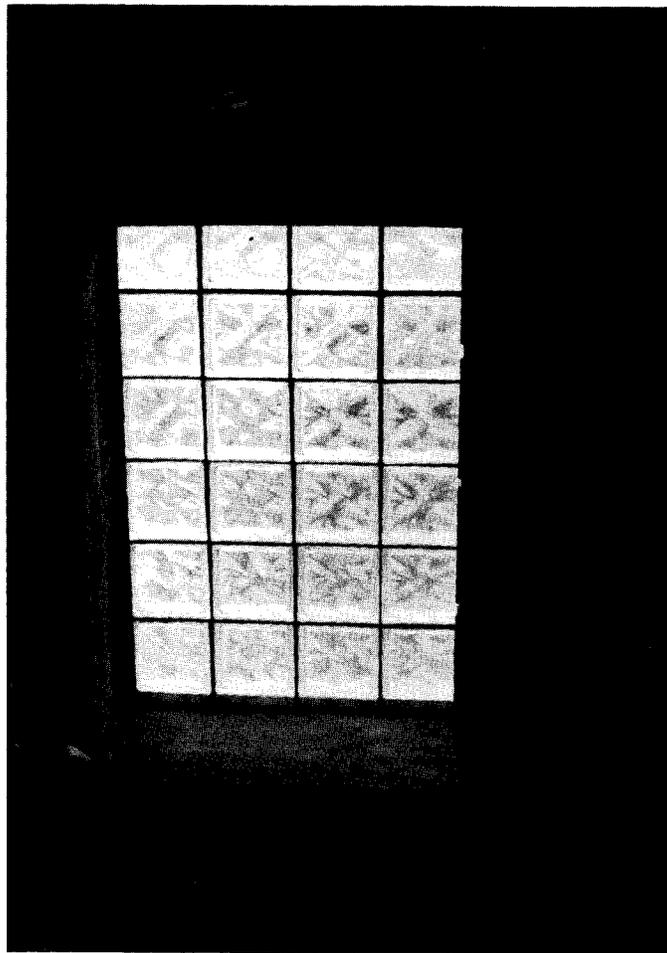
Room 112, Weight Deck window opening in northwest wall.
